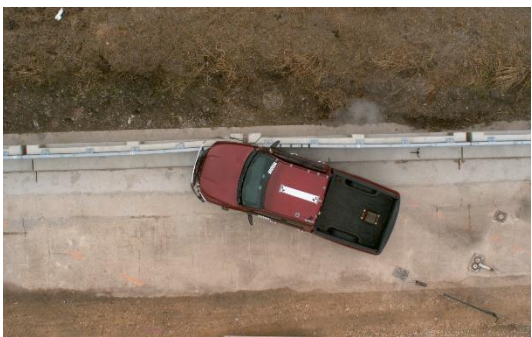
Sequential photographs for Test No. 606861-3 (overhead view).
